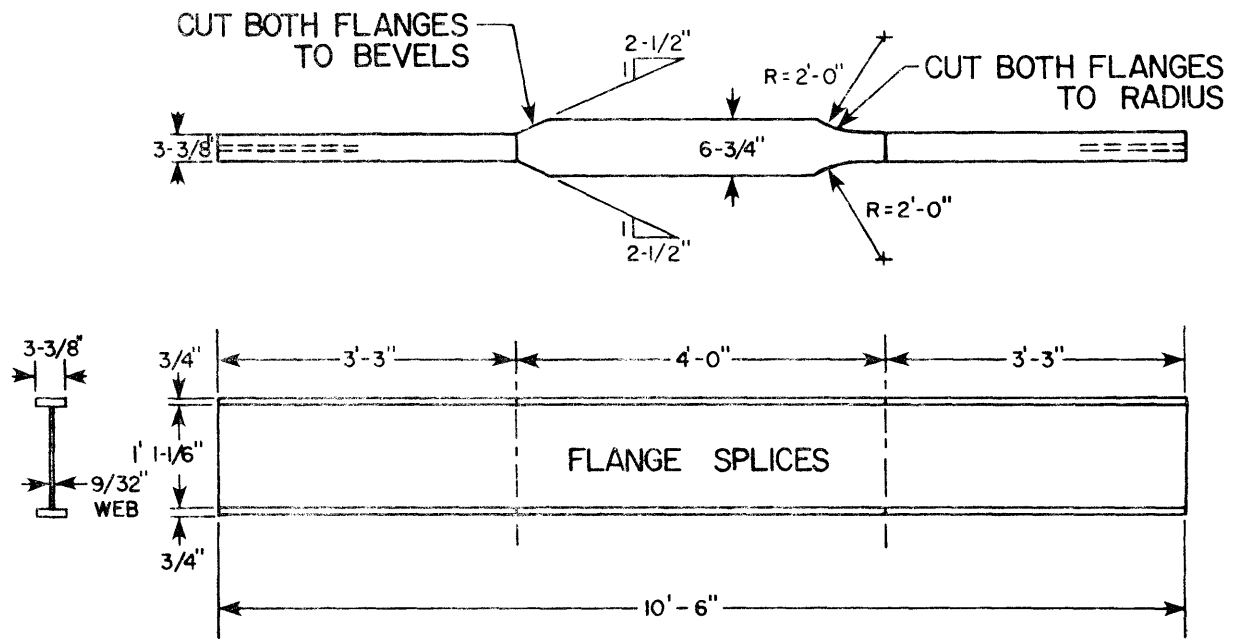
Details of beams with flange splices (from Ref. 3)
